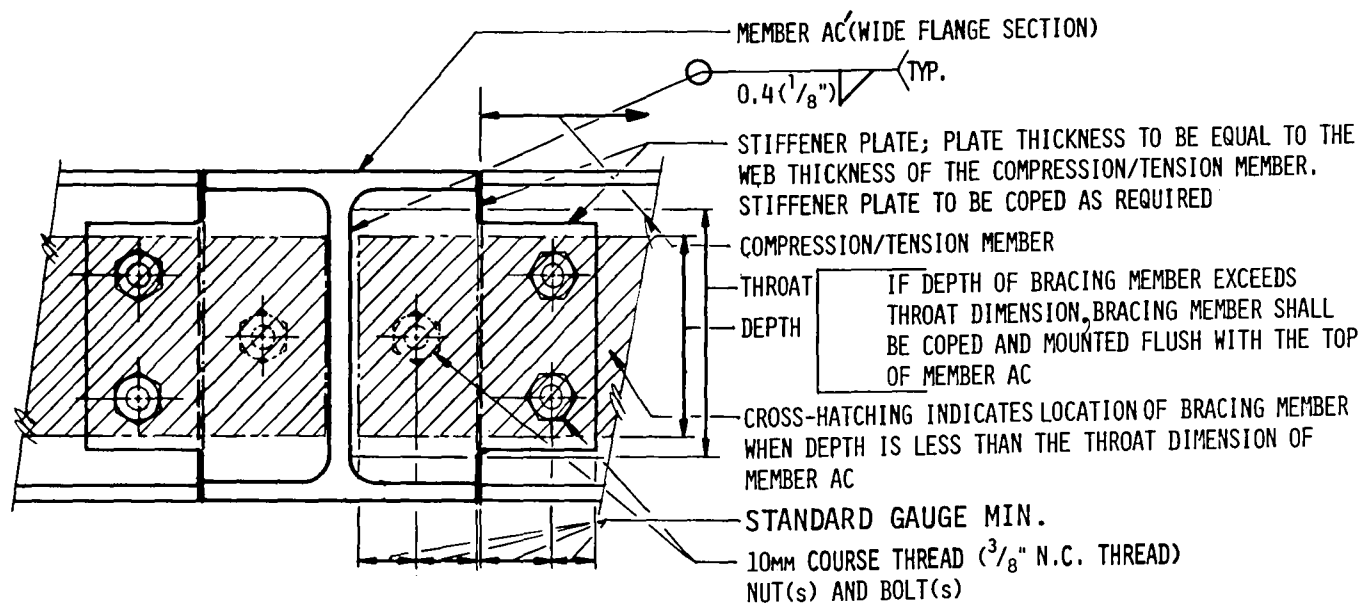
C. Horizontal Bracing Strut Connection Detail Type 3 For Two-Tier Single Span Structures
